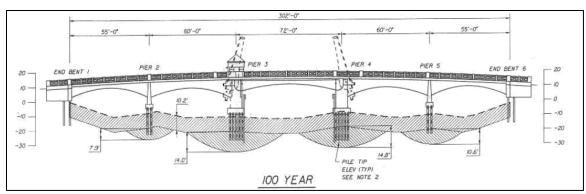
Venetian Causeway Bridge 1 (8DA14373), Profile of Bascule Span
